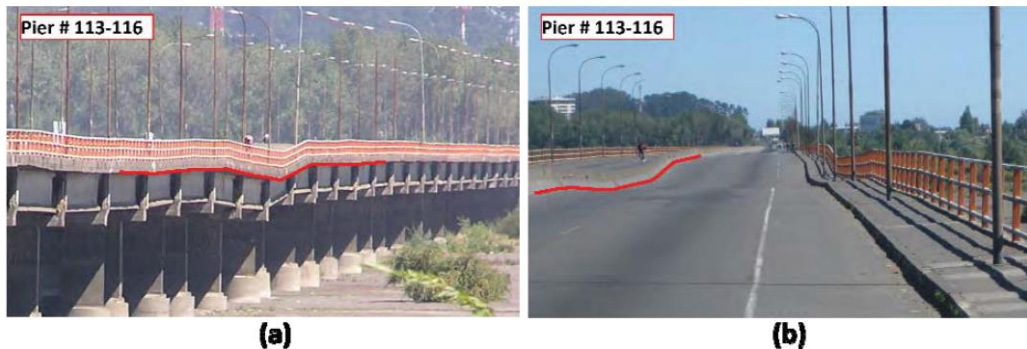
Juan Pablo II bridge (a) View of bridge bent settlement (S36.826596° W73.094345° on 3/15/2010)(b) View of bridge deck settlement (S36.826596° W73.094345° on 3/15/2010)
